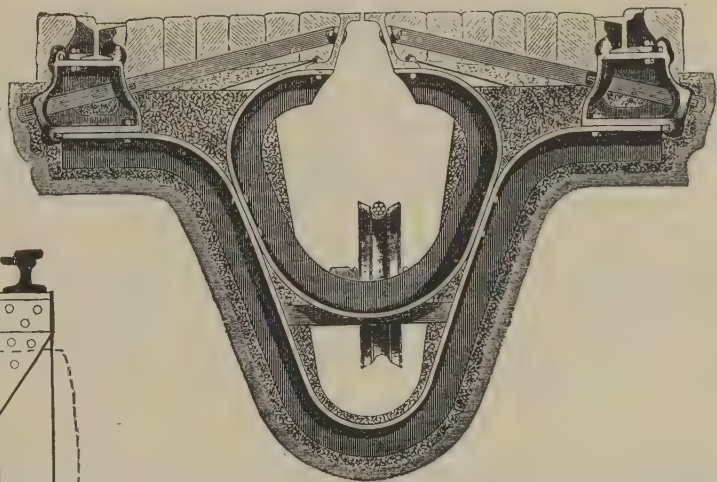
ORIGINAL CONSTRUCTION—CHICAGO CITY CABLE RAILWAY—DEPTH OF CONDUIT 36 INCHES.
